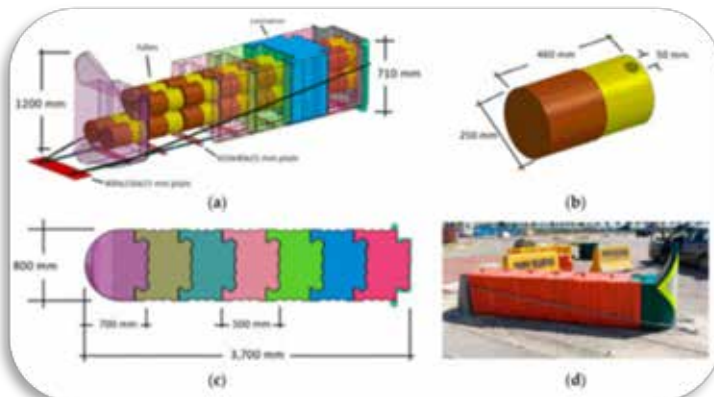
Details of Ulukur Crash Cushion Developed - Ulukur crash cushion (UCC) design is composed of linear, low density polyethylene (LLDPE) containers, energy-absorbing tubes, steel cables, lower plates, and back support plate. Geometrical details of these materials are provided in Figure 2.
